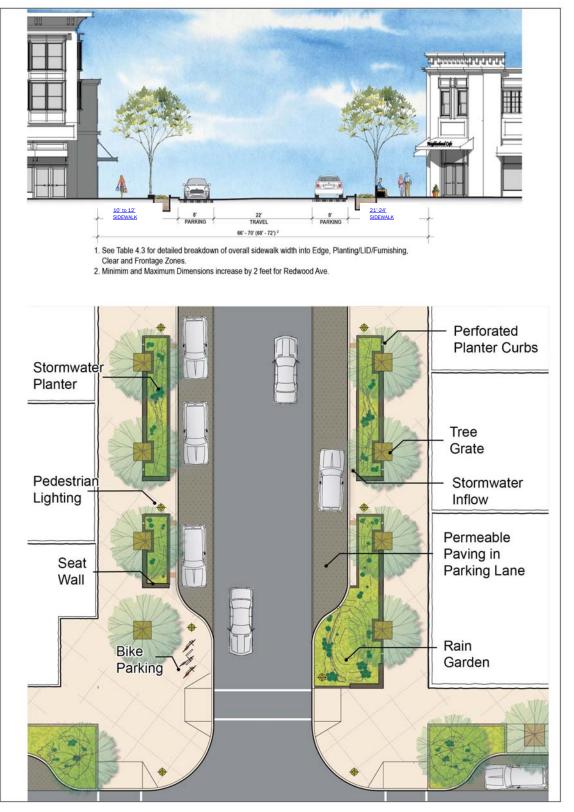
A MIXED-USE STREET/REDWOOD AVENUE ALTERNATIVE 1 (WITH STORMWATER PLANTERS)
